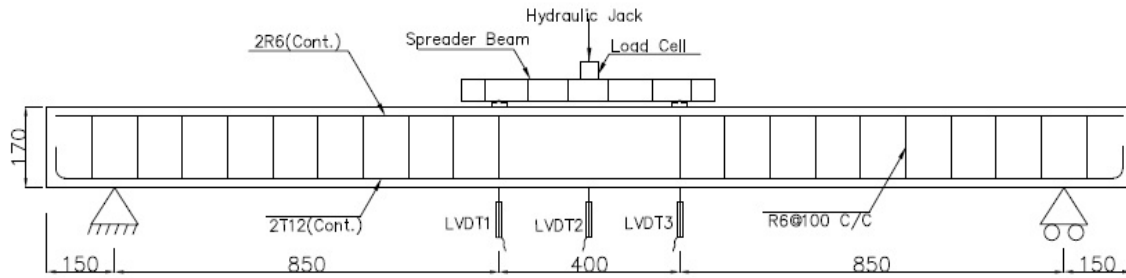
Schematic four-point loading test setup used in this study (dimensions in mm)
